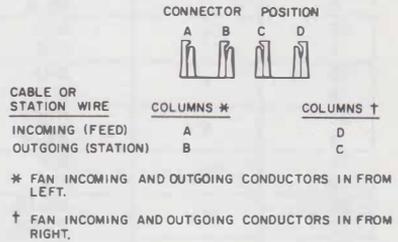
Numbering and Wiring Plan for 66M1-50 Connecting Blocks
